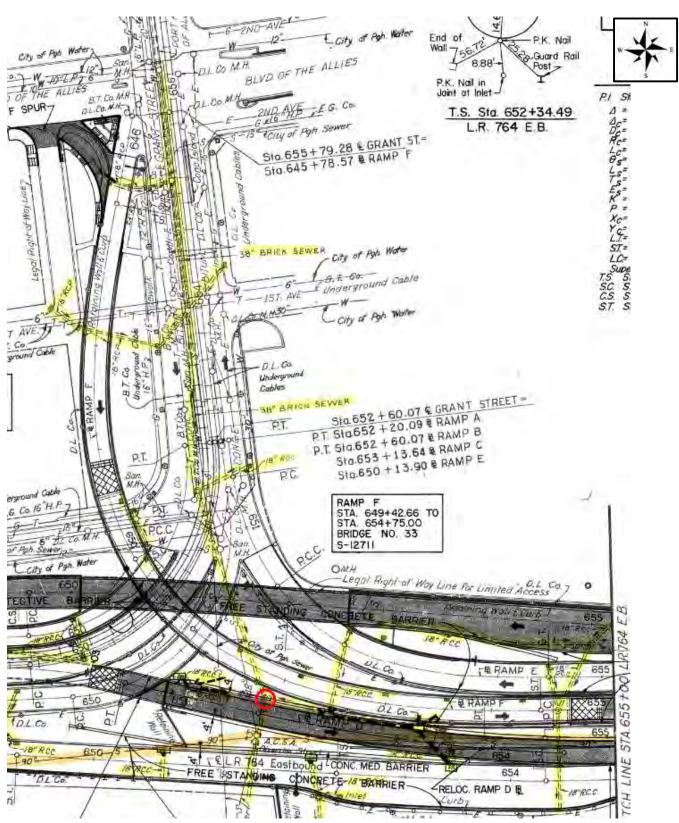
Roadway Plan and Storm Sewer in the area southeast of Ramp D Tunnel showing ALCOSAN Manhole (SWMM model Node J9)
